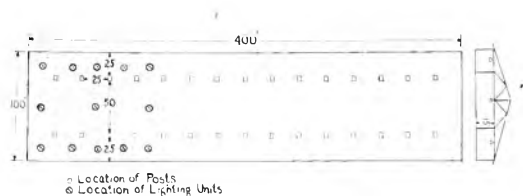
Diagram Showing Typical Freight Pier Lighting Layout
